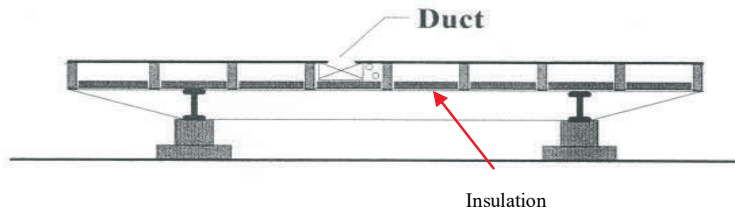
Insulation on bottom of floor cavity – floor joists running length of mobile home
